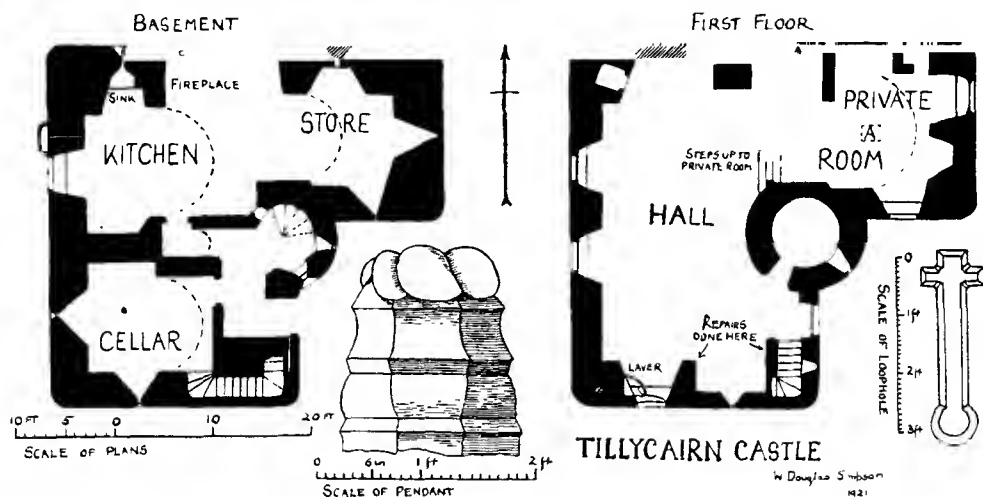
Tillycairn Castle: plans of basement and first floor.
